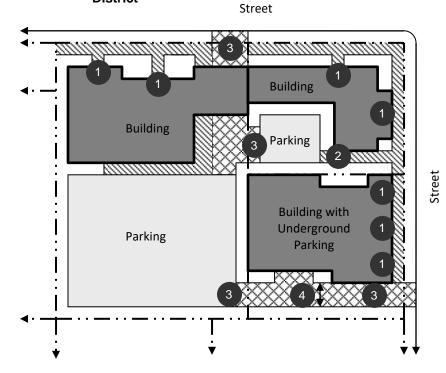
Examples of Lot Size and Building Placement in the Transit-Oriented District
